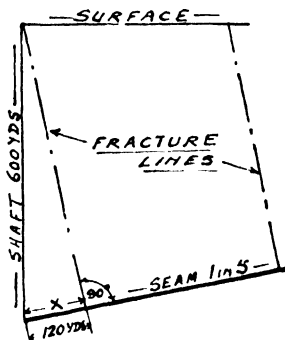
Possible Fracture Lines for Inclined Seam.
